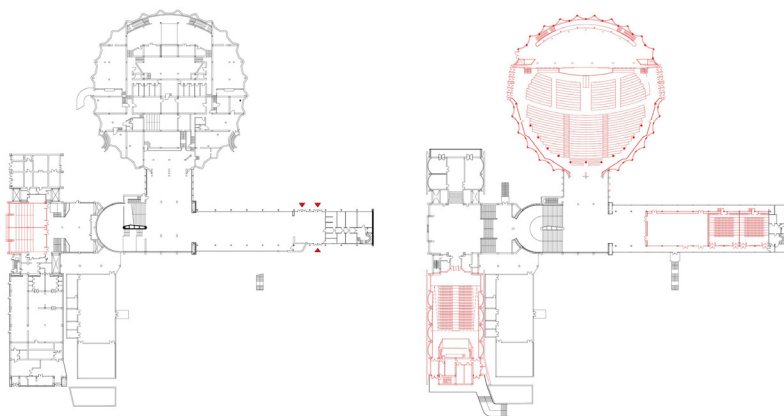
Panoramic Cinema—current condition plans. Left: ground floor; right: first floor. Cinema and multifunctional halls highlighted in red
